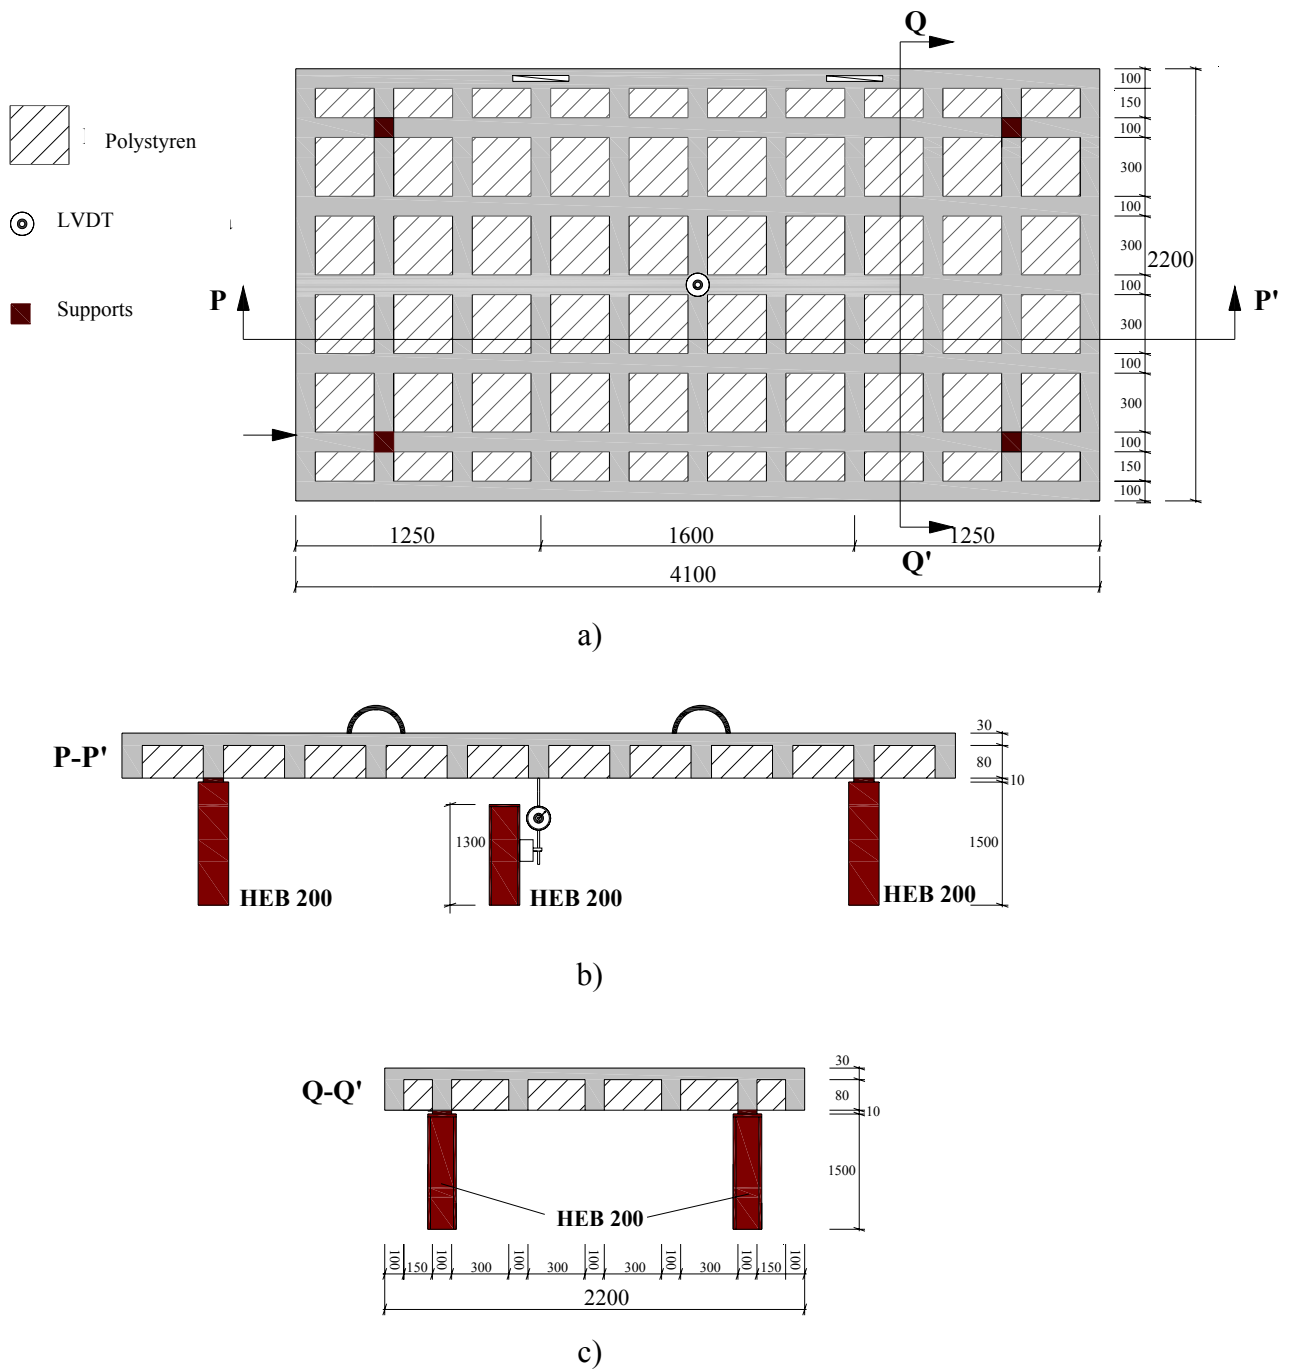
Setup of the loading test: a) general view; b) section P-P'; c) section Q-Q' (dimensions in mm)
